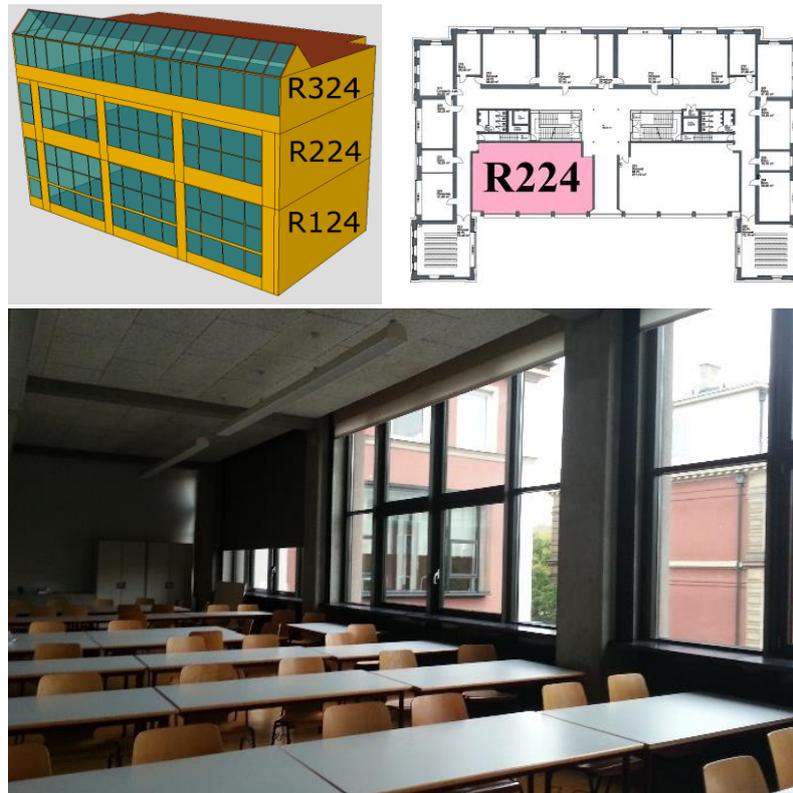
Top-left: 3D-Model of the selected lecture halls; Top-right: Second floor plan of Building 3 and the selected lecture hall 224; Down: picture of the classroom
